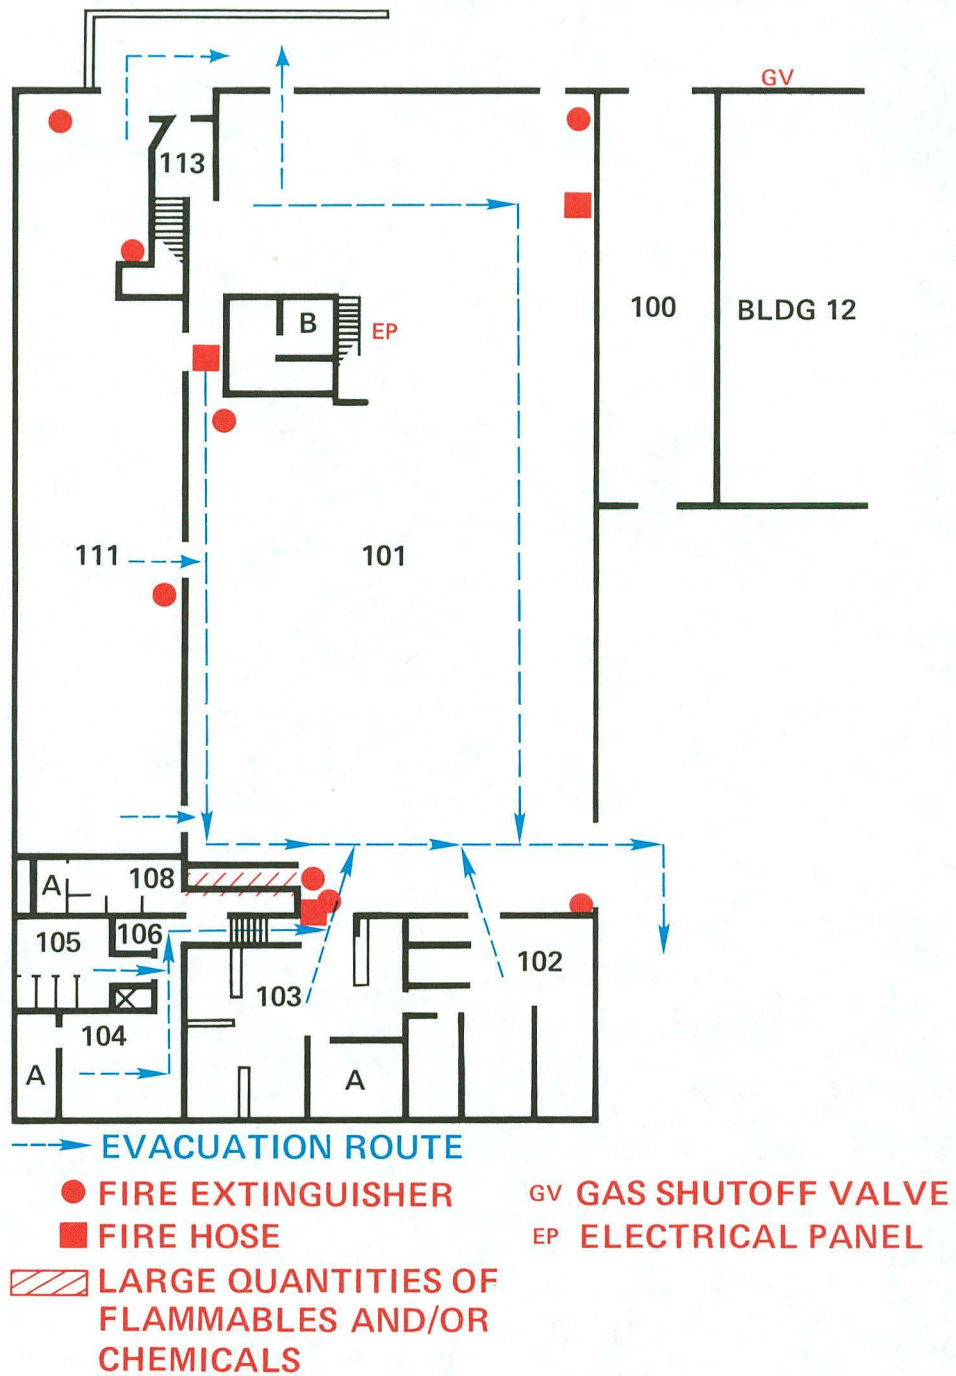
Building 7, 1st FLOOR evacuation routes and fire equipment.
